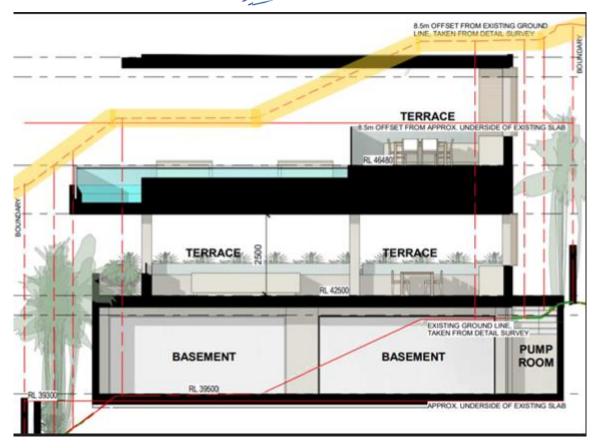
Section through the dwelling house showing the extent of height exceedance
